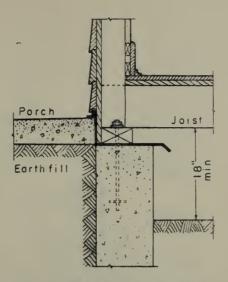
BREAD-PAN, OR THROUGH SHIELD OVER WALL AND PORCH
